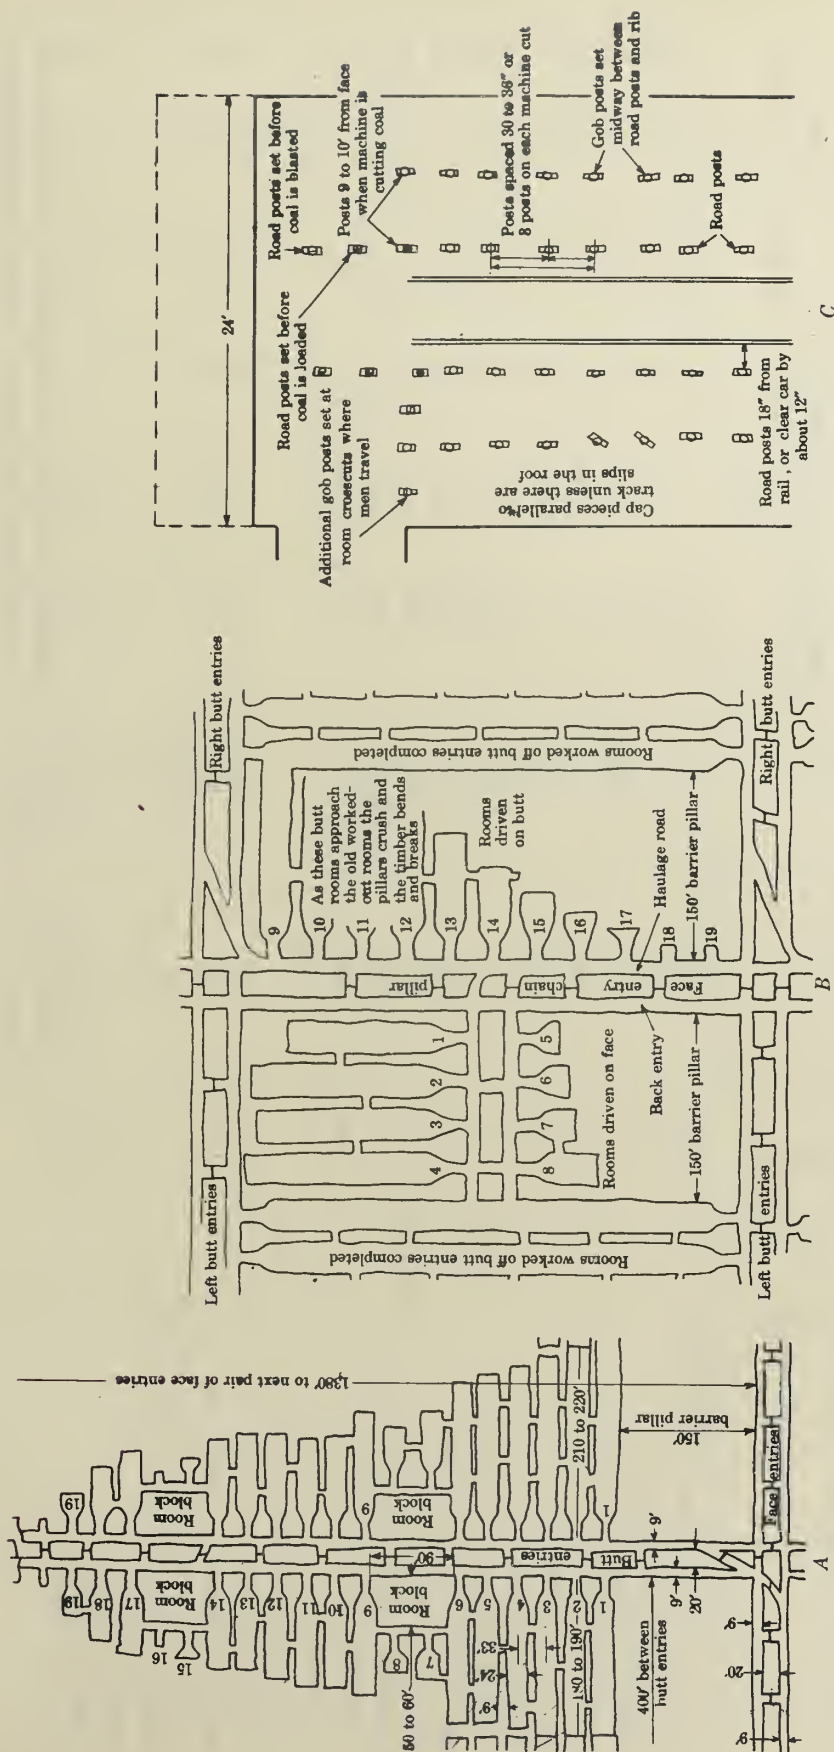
Details of development and room timbering, Type A mines: A, Room blocks left to protect butt entries under light cover in eastern Ohio; B, method of mining part of barrier pillars; C, plan of room timbering in a mine in Belmont County, Ohio.
